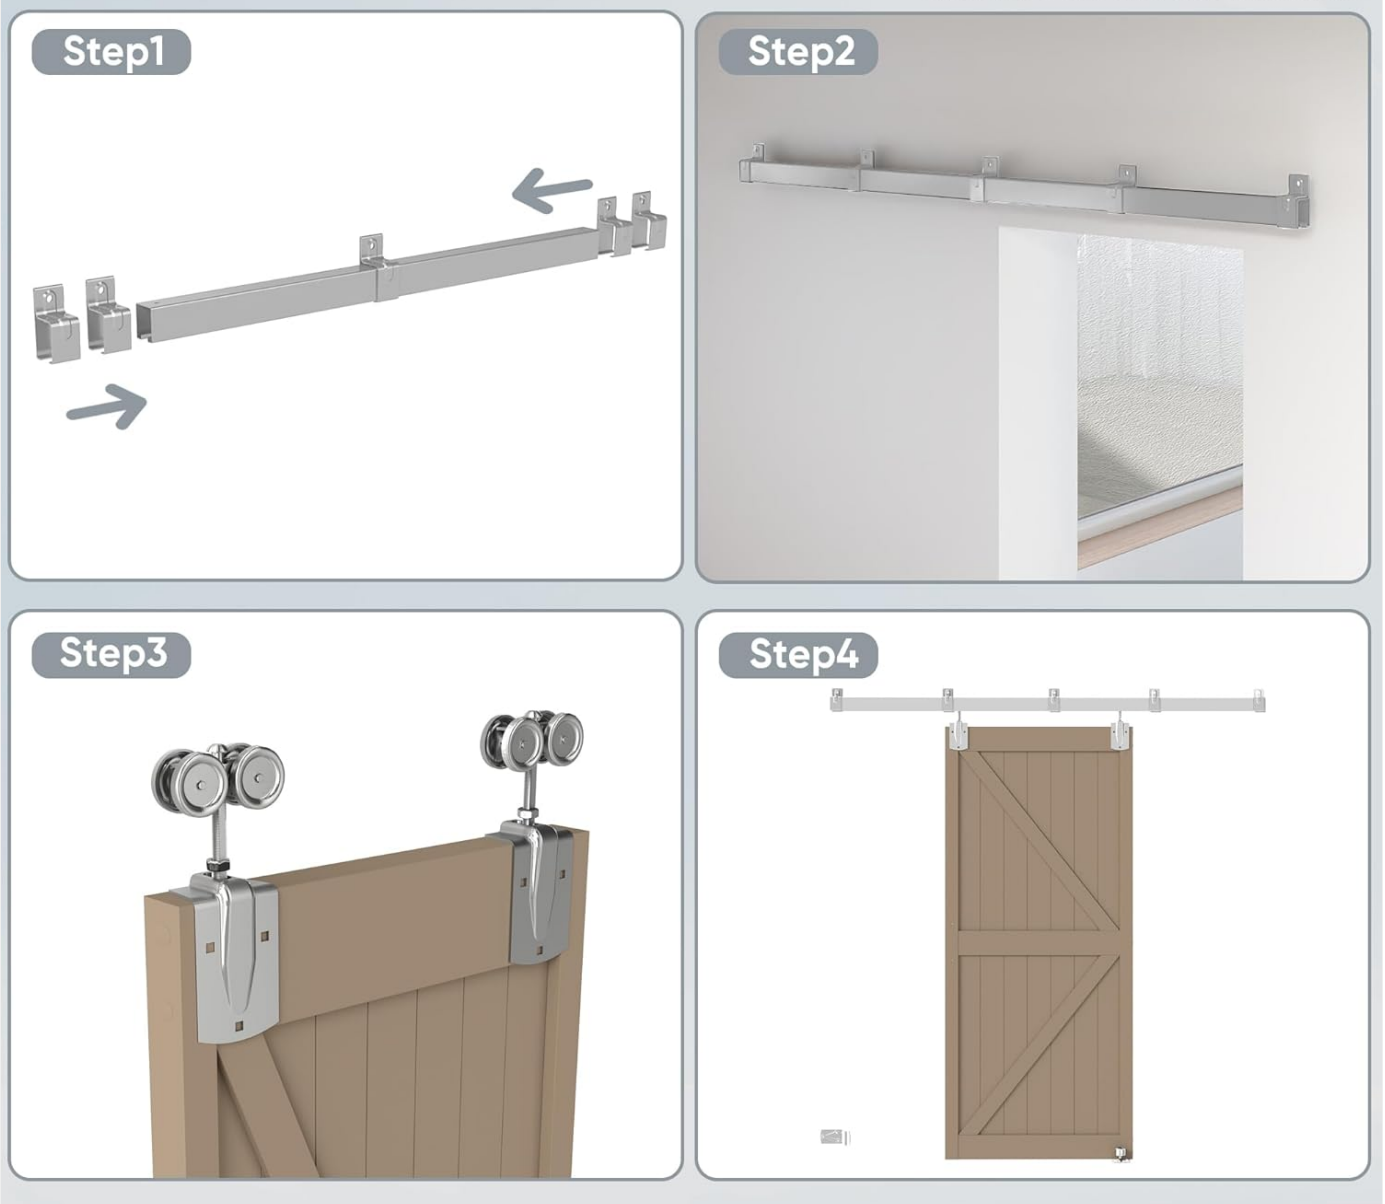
Visual representation of the four main installation steps: mounting the track, attaching hangers to the door, hanging the door, and installing stoppers and floor guide.
